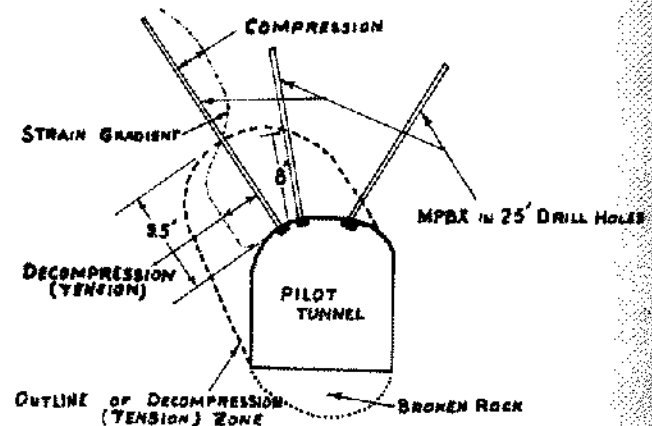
Extensometer readings outlining decompression zone in rock of tunnel roof, Straight Creek Tunnel, Pilot Bore. (Modified from Hartman, 1966).
